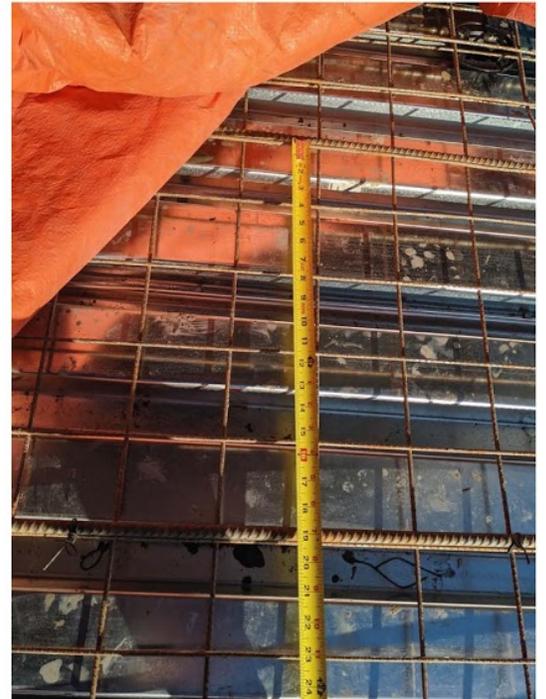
STEEL REINFORCING AT CANTILEVER EDGE
